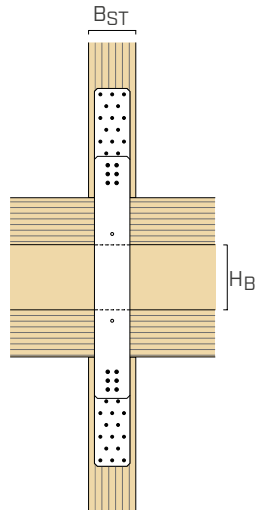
## PLATE COUPLING FOR INTER-STOREY WALL-PLATE
